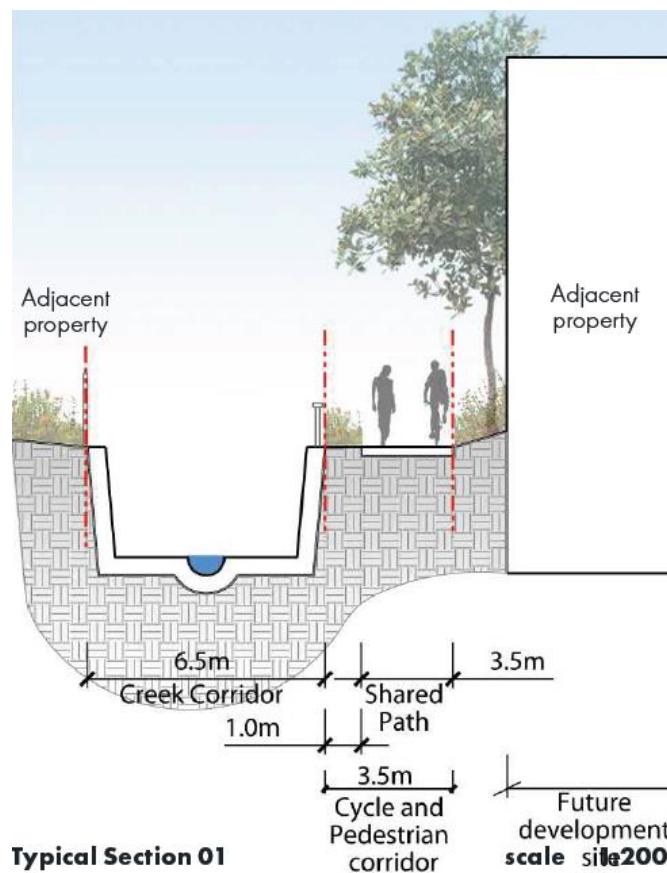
Section across Johnstons Creek, the planned 3.5m wide shared path, and the future building at 1-5 Chester Street (source: Leichhardt and Camperdown Precincts Public Domain Master Plan)
